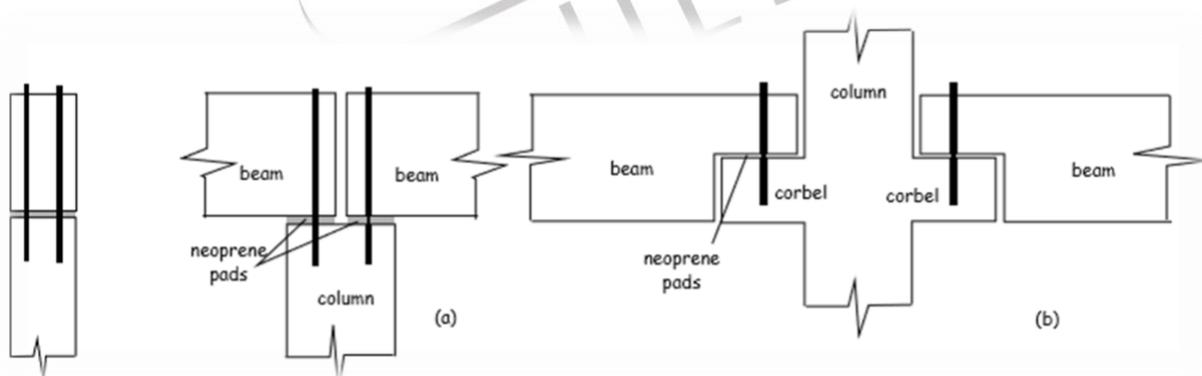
Beam-column connection for roofs (a) and for floors (b).
